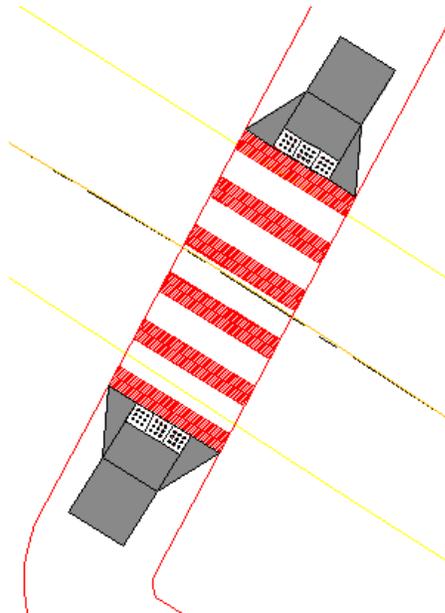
Cross walk at Lucas Street with ADA ramps.
